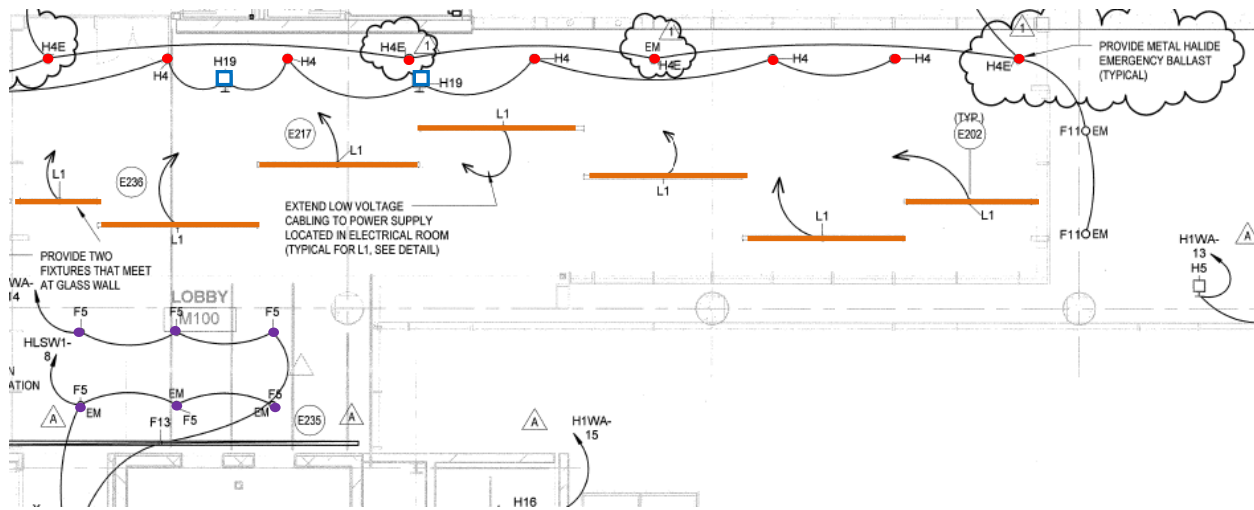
Lobby Lighting Plan Mezzanine Level (NTS)
